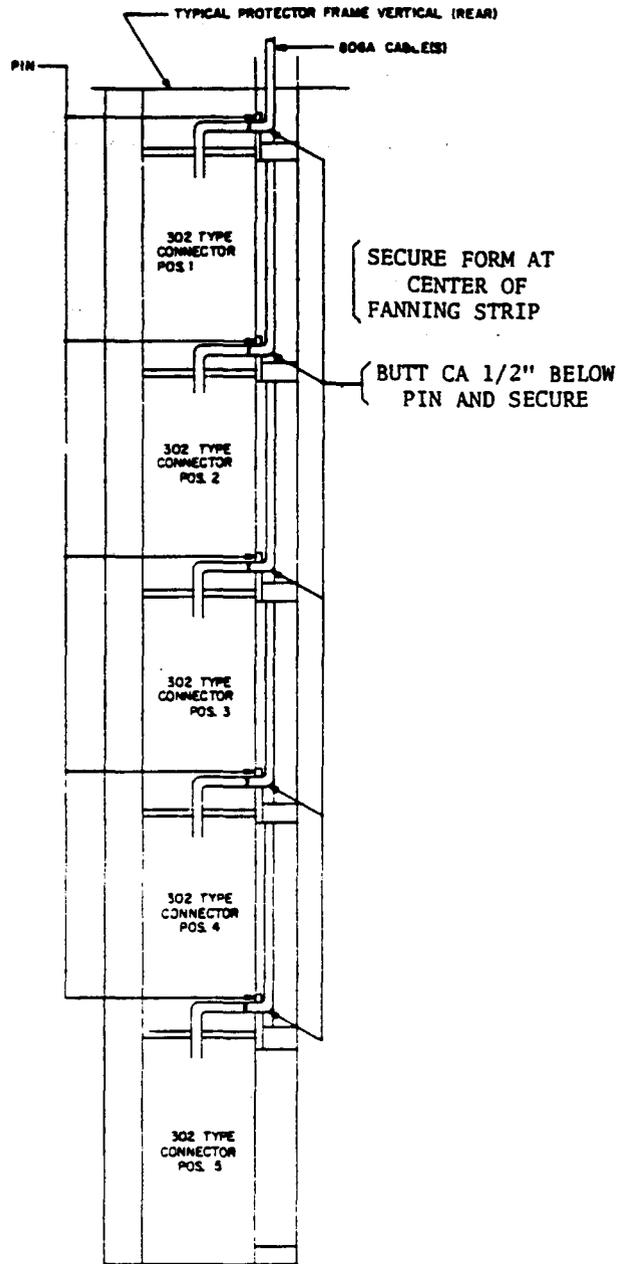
TYPICAL BUTTING AND RUNNING OF CABLE AT EACH VERTICAL CONNECTOR POSITION
